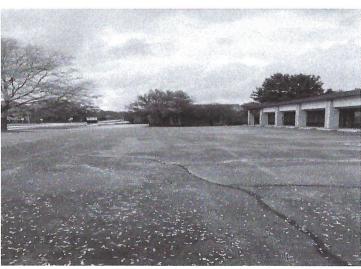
Looking east at existing asphalt pavement. Pavement appears to be in good condition with sign of deterioration or exposed soil.
